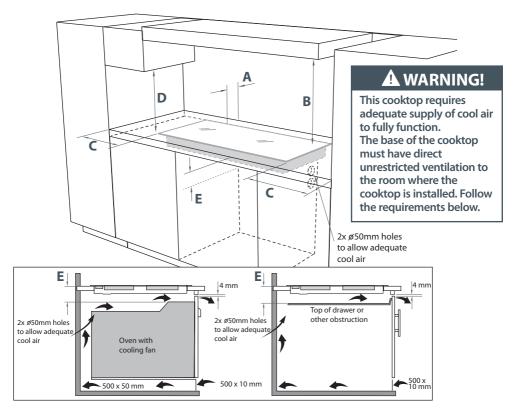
Minimum clearances and ventilation requirements - oven installed below cooktop
